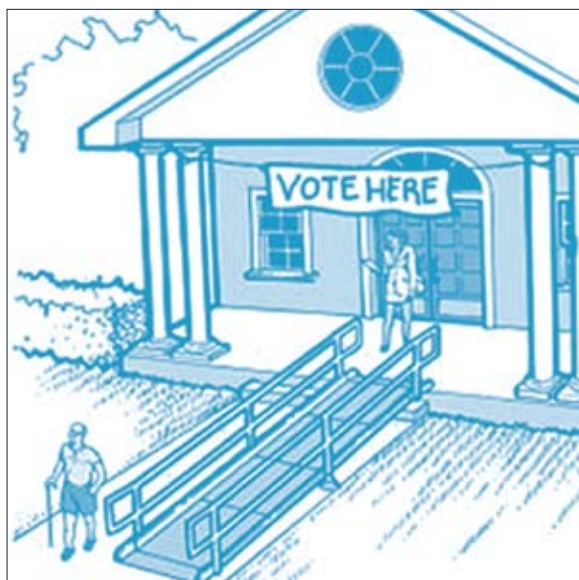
A portable ramp with handrails and edge protection is installed over a step(s) at the entrance of a polling place.
